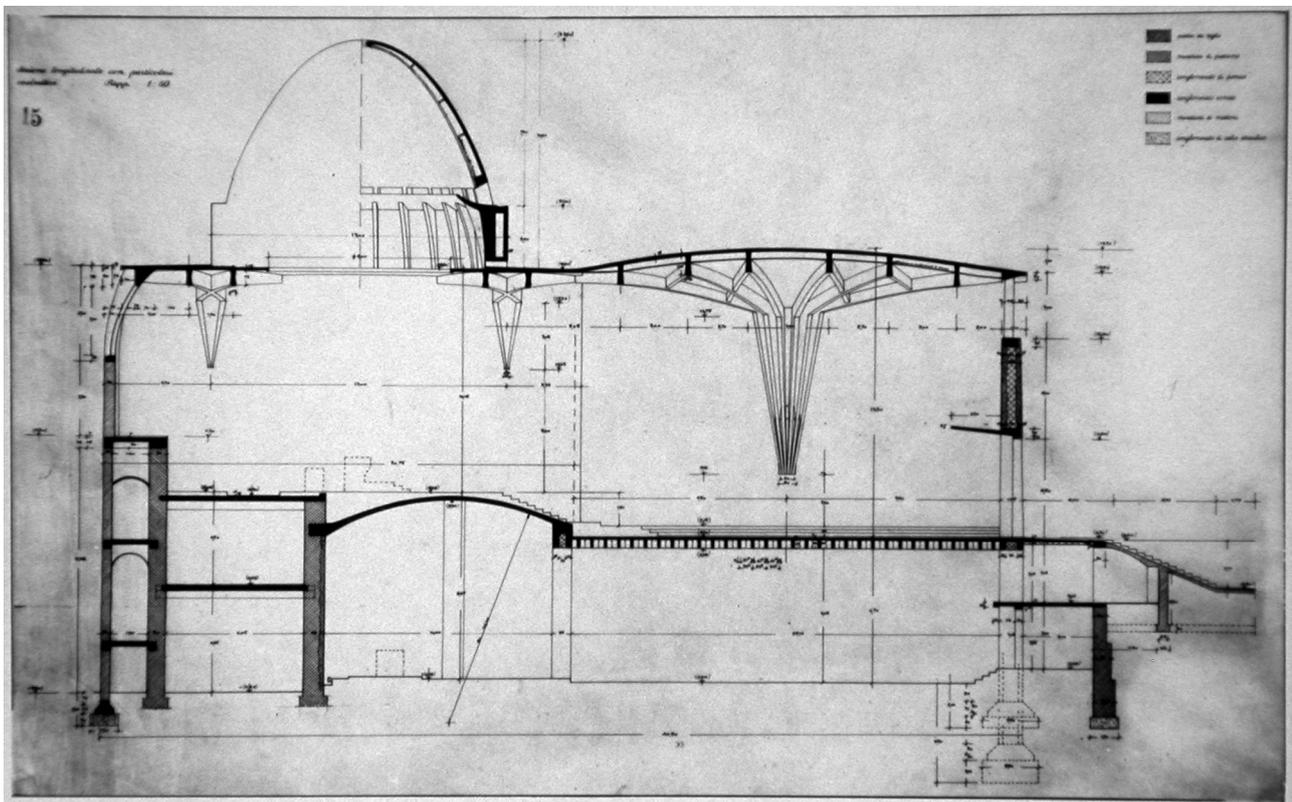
Longitudinal section (in black the reinforced concrete elements, in grey the limestone)
